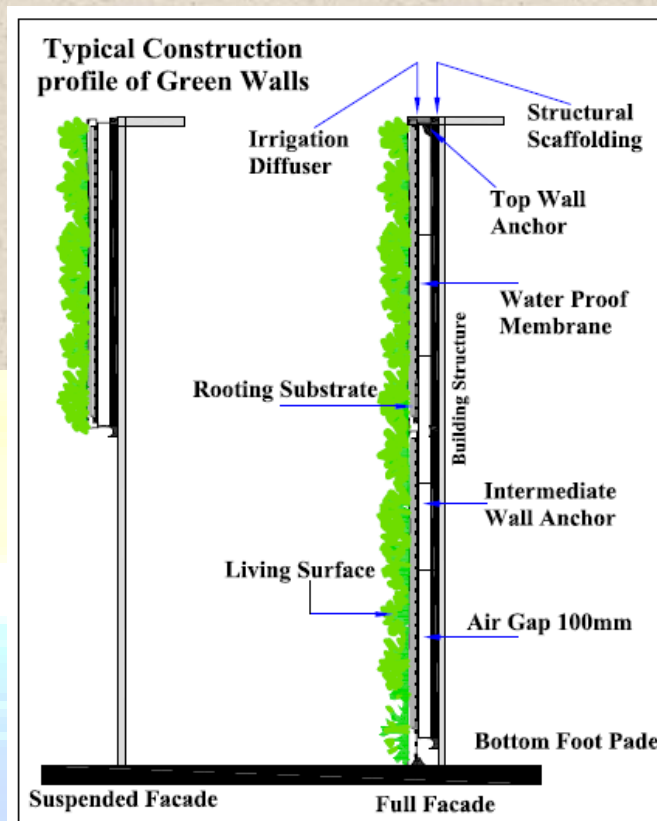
Section showing the details of the Green Walls, source - GSky.com
